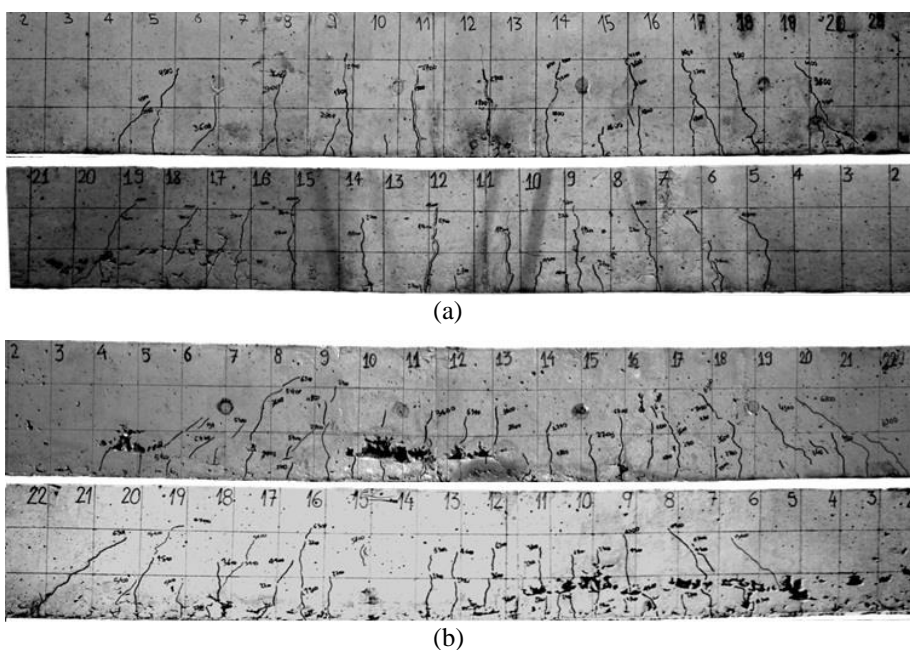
Cracking patterns and failure modes: (a) B and (b) S beams. Front and back beam's faces are shown.
